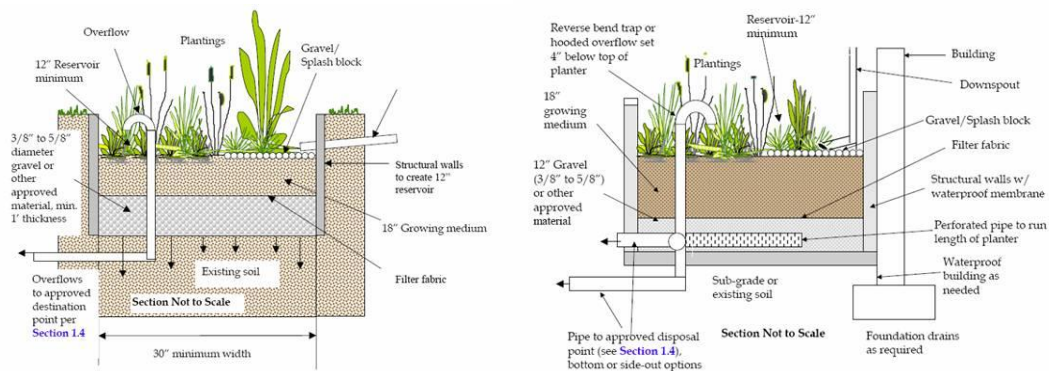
Infiltration planter (left) and flow-through planter (source: ci.sandy.or.us)
